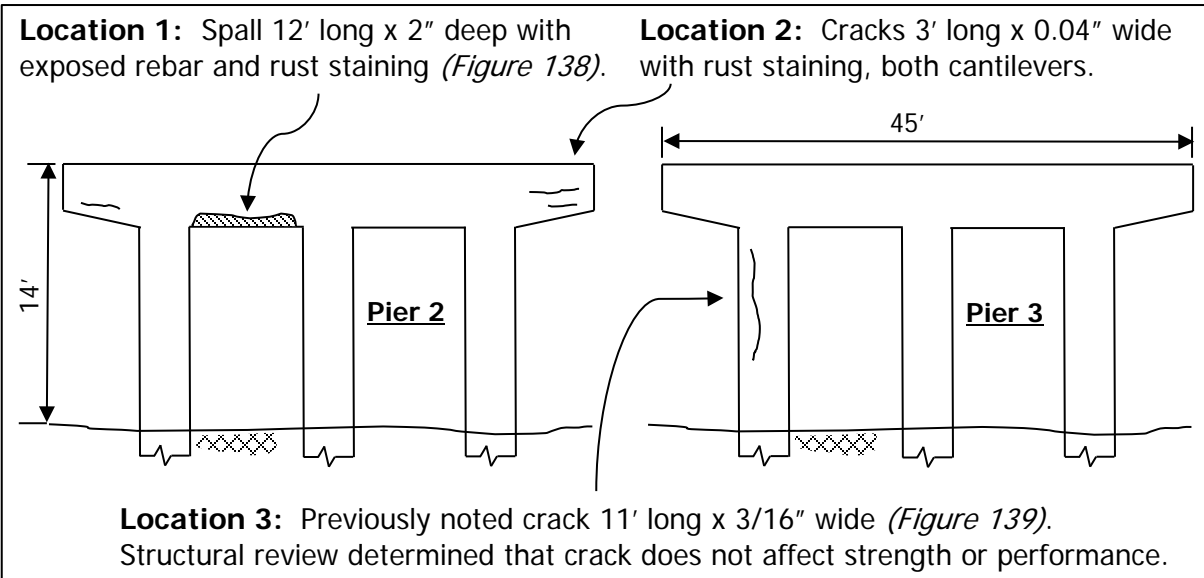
Elevation view of two concrete column piers showing substructure defect locations.
